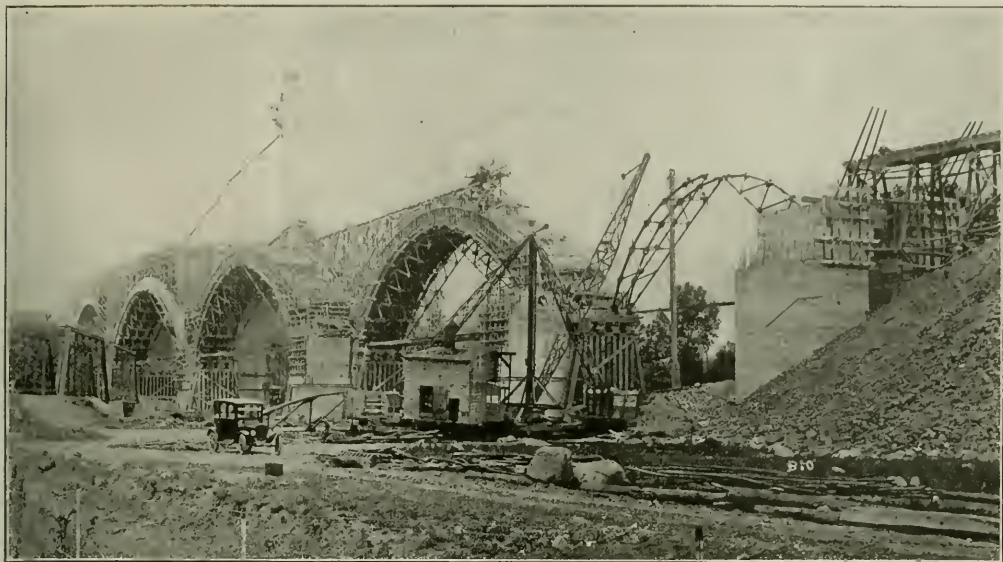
CONSTRUCTION WORK AT BRIDGE SHOWING ARRANGEMENT OF PLANT AND ARCH CENTERING
